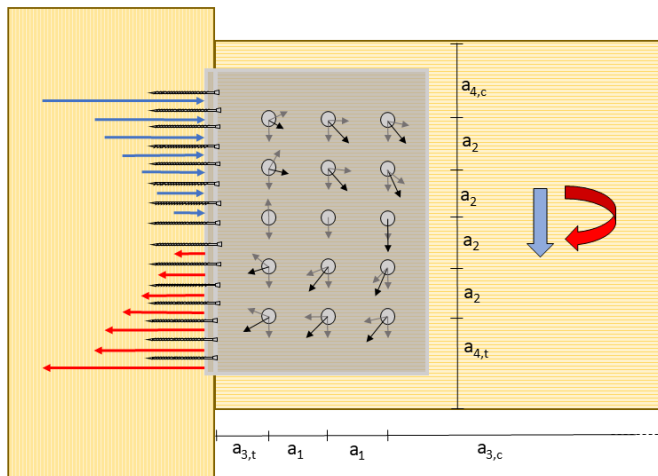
An illustration of a column-beam timber joint, and the resulting load in the fasteners caused by loading the beam with a moment and a vertical load
